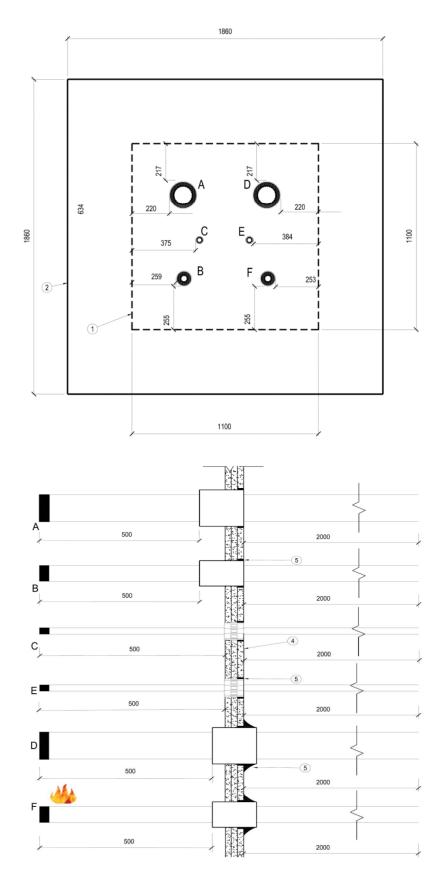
Plan view and cross section of test specimen and cut hole locations as shown in FSRG A-13-823A – dimensions in mm
